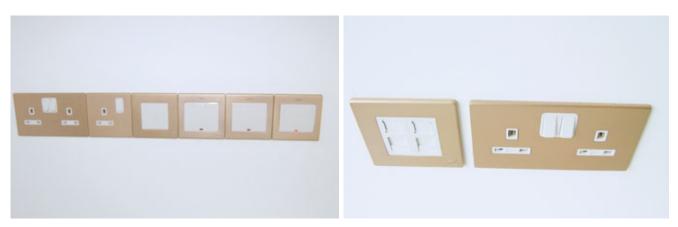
The clip-type face plate can be installed at the final stage of construction.
